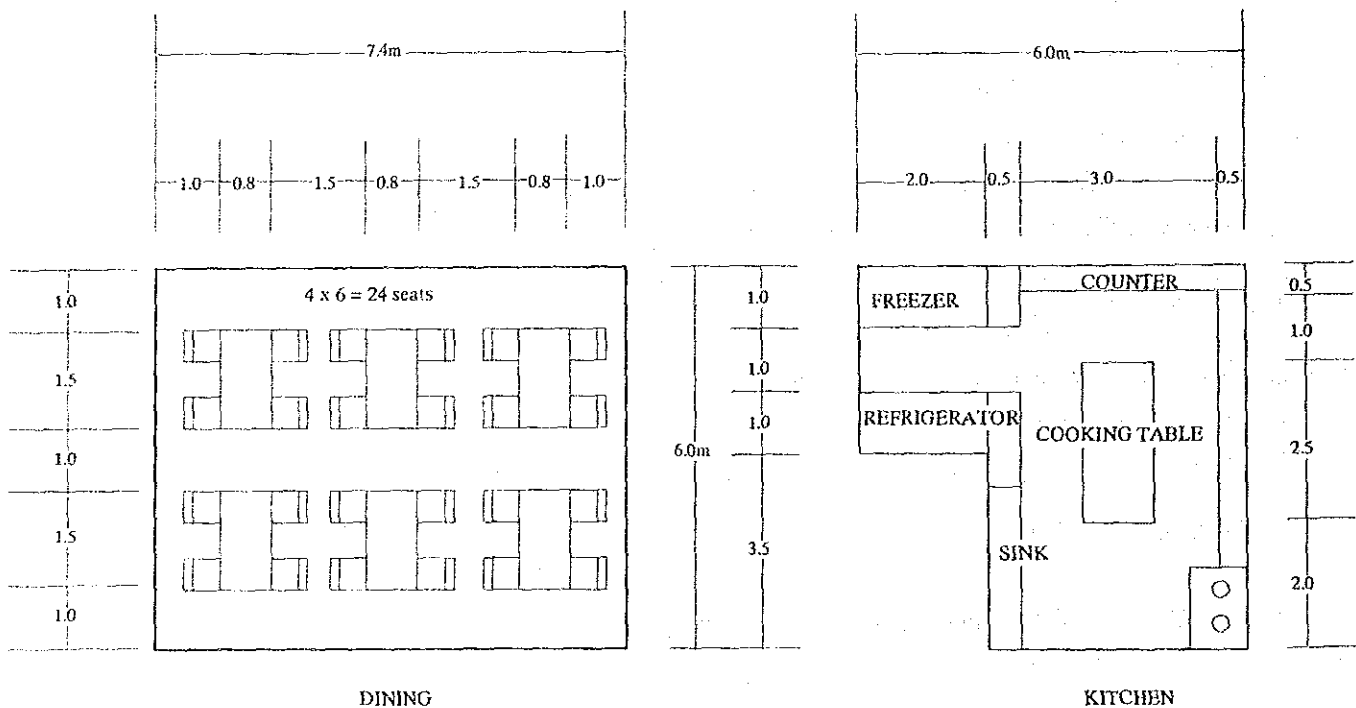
Layout Plan for Dining Room and Kitchen
